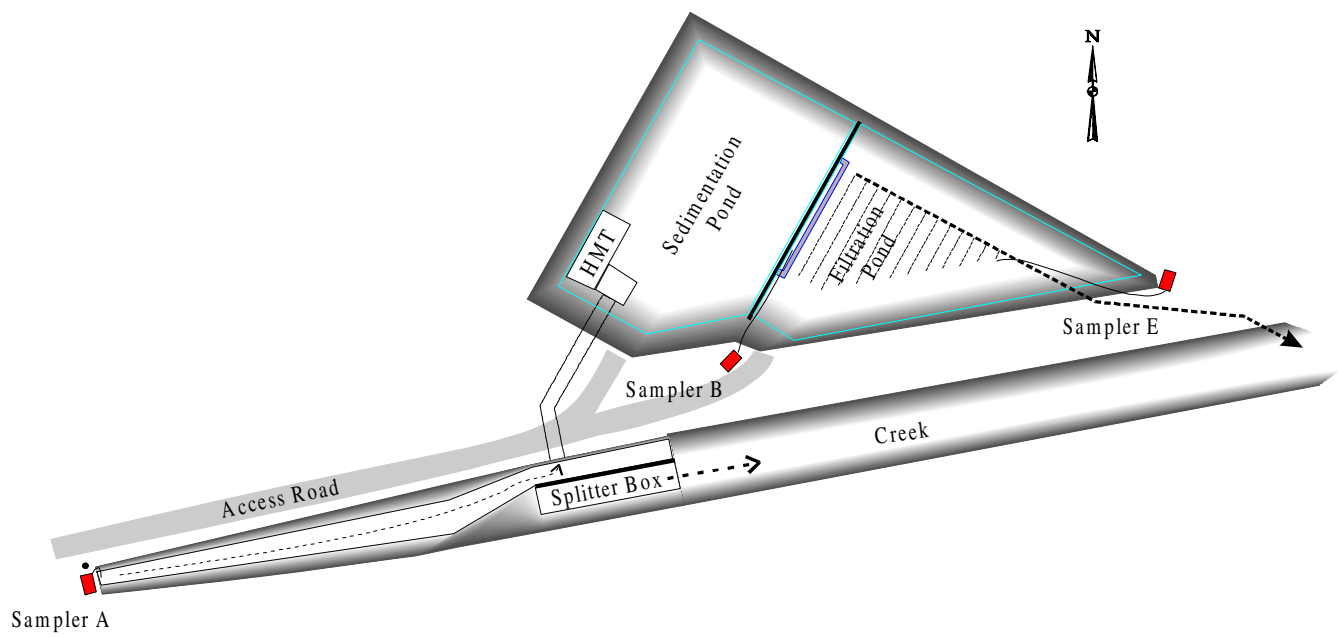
The Seton Pond Sedimentation/Filtration Facility: Plan View
